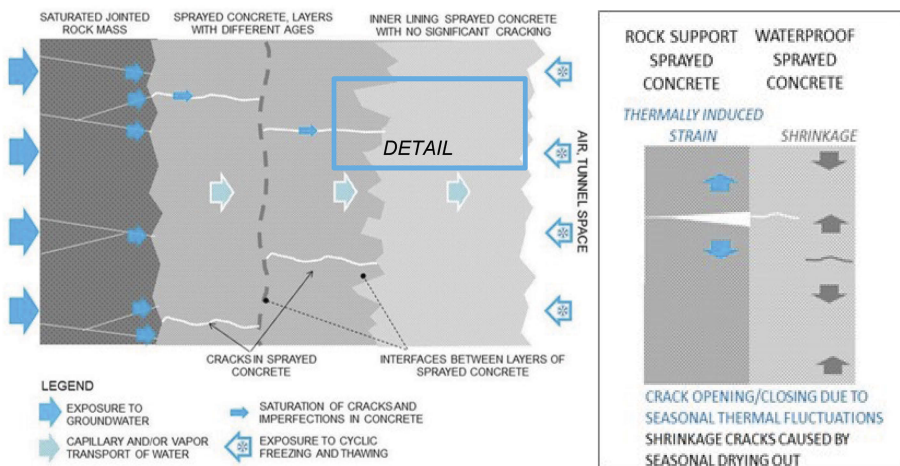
Principal sketches illustrating the layout and function of a lining structure with waterproof sprayed concrete. Left: Lining section with the rock support and waterproofing layer. Right: Detailed section of interface between rock support sprayed concrete and the waterproof sprayed concrete.
